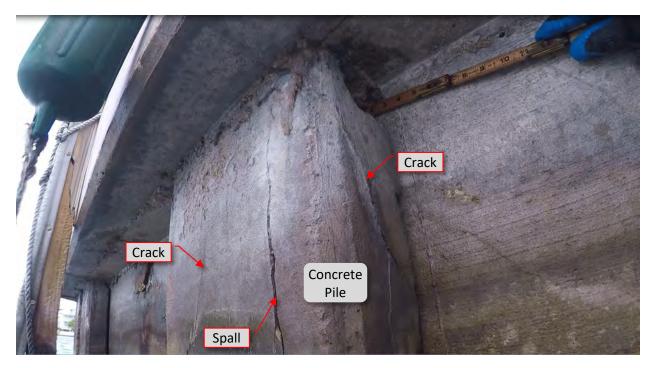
P42. STA 5+93. Crack/spalls at both flanges at pile and loss of concrete.
